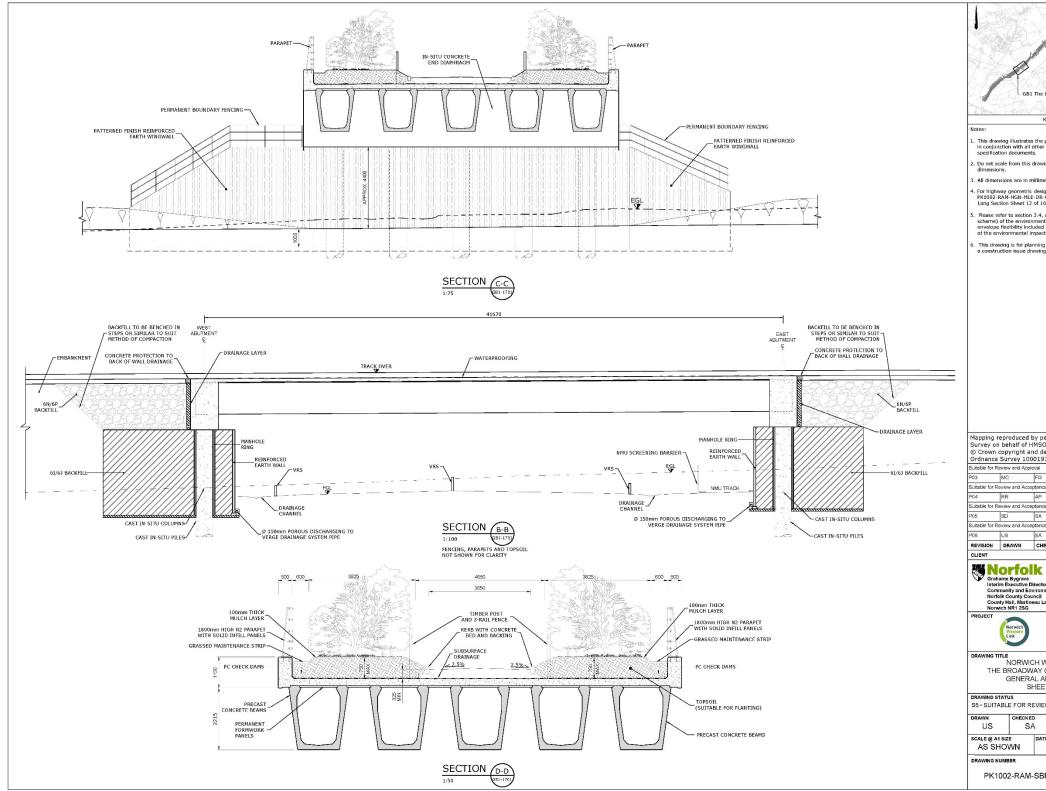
The General Arrangement Drawings for The Broadway Green Bridge GB1, illustrating the structural cross section of the green bridge
